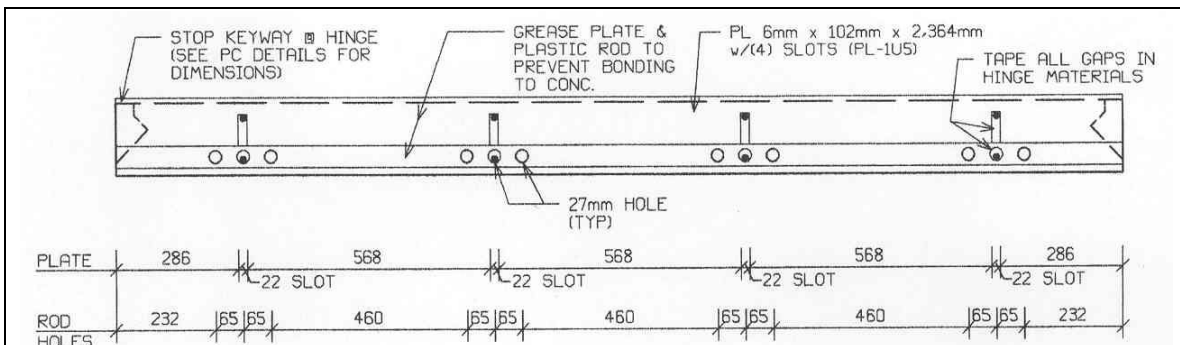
Typical NU-Deck panel hinge section (NDOR, 2003)
